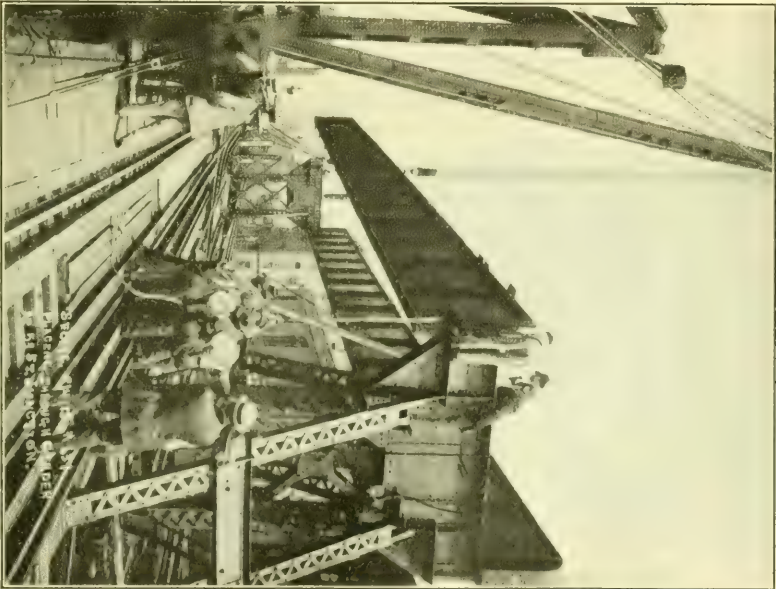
STATION ON EIGHTH AVENUE AT 155TH STREET. TEMPORARY PLATFORM.
